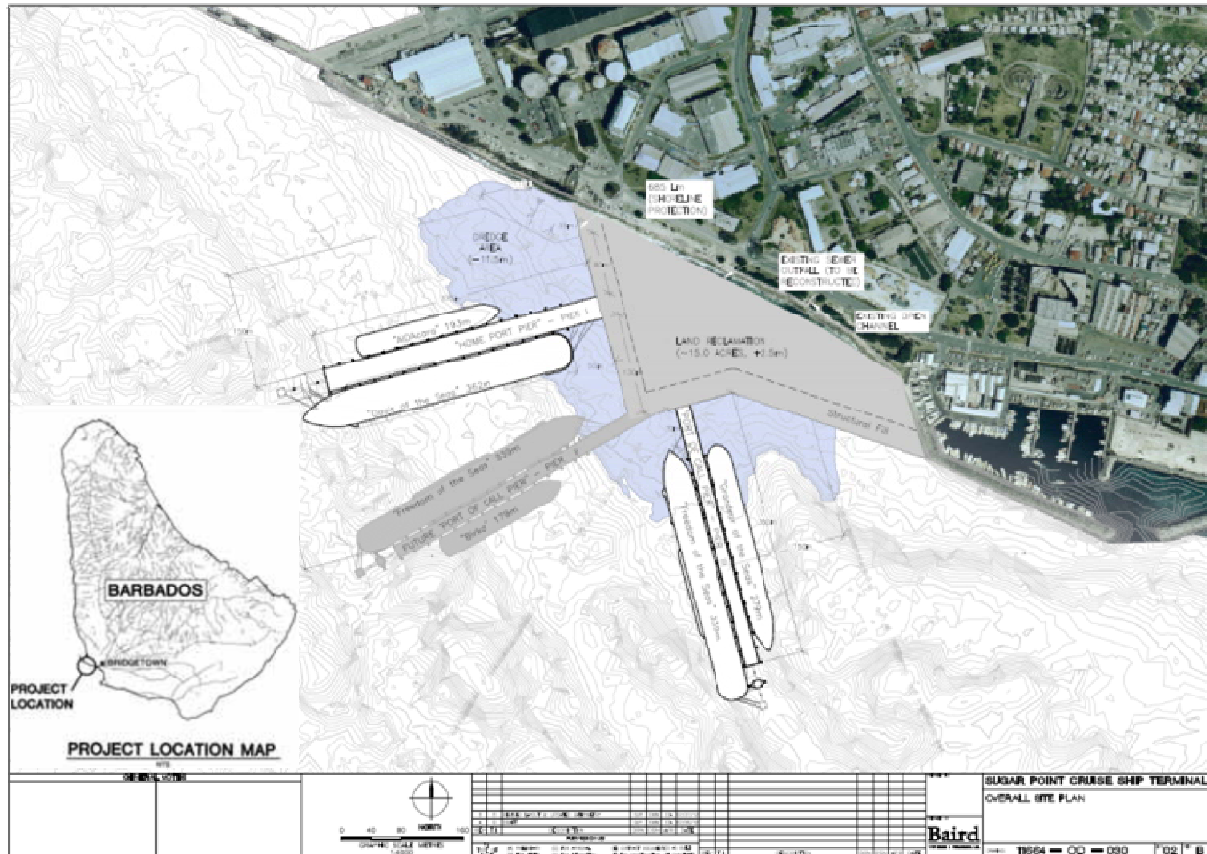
Location and layout plan of the Sugar Point Cruise Ship terminal.
